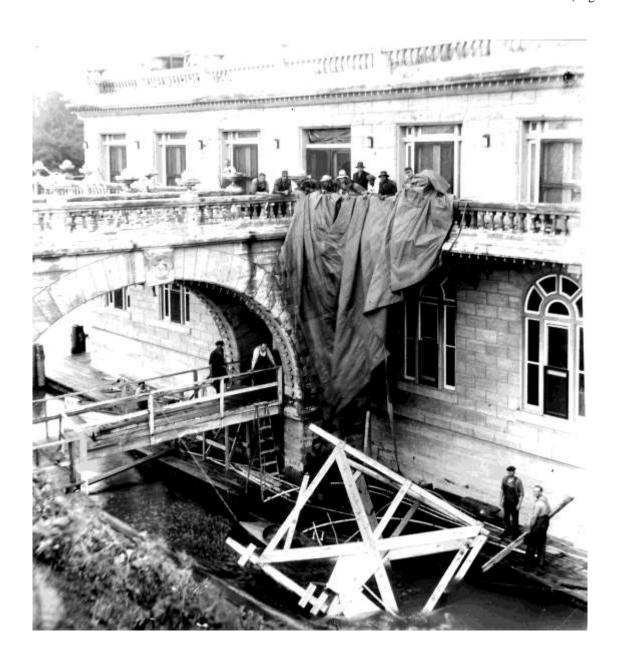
Undated photograph [ca. 1929], Staley Pumping Station and Club House, illustrating storm damage. A frame structure, canopy frame and canvas covering—all ended up in the lake below, landing partially on small boat in lake below. Several torch light globes and windows were broken (Staley Museum). Archival references suggest that the Roof Level was no longer used in ca. 1929, suggesting that this storm may date to that time period and that the canopy simply was not rebuilt.
